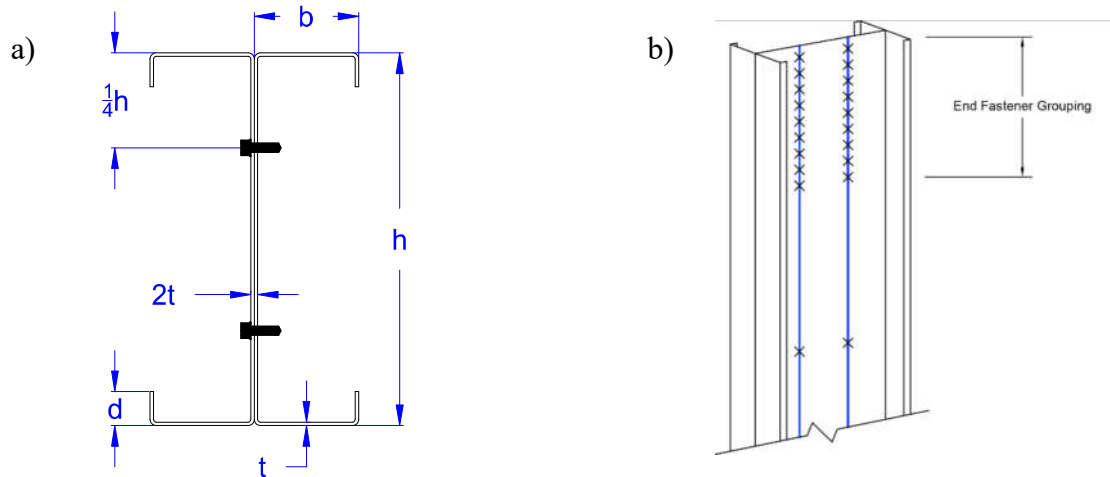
a) The built-up, back-to-back section studied, showing the location of the web interconnections via screws and b) an example of the AISI-recommended fastener layout at the column ends.
